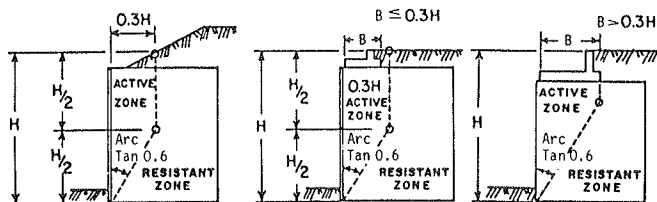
Maximum tensile force lines in a bridge abutment. [Schlosser and Segrestin, 1979]
